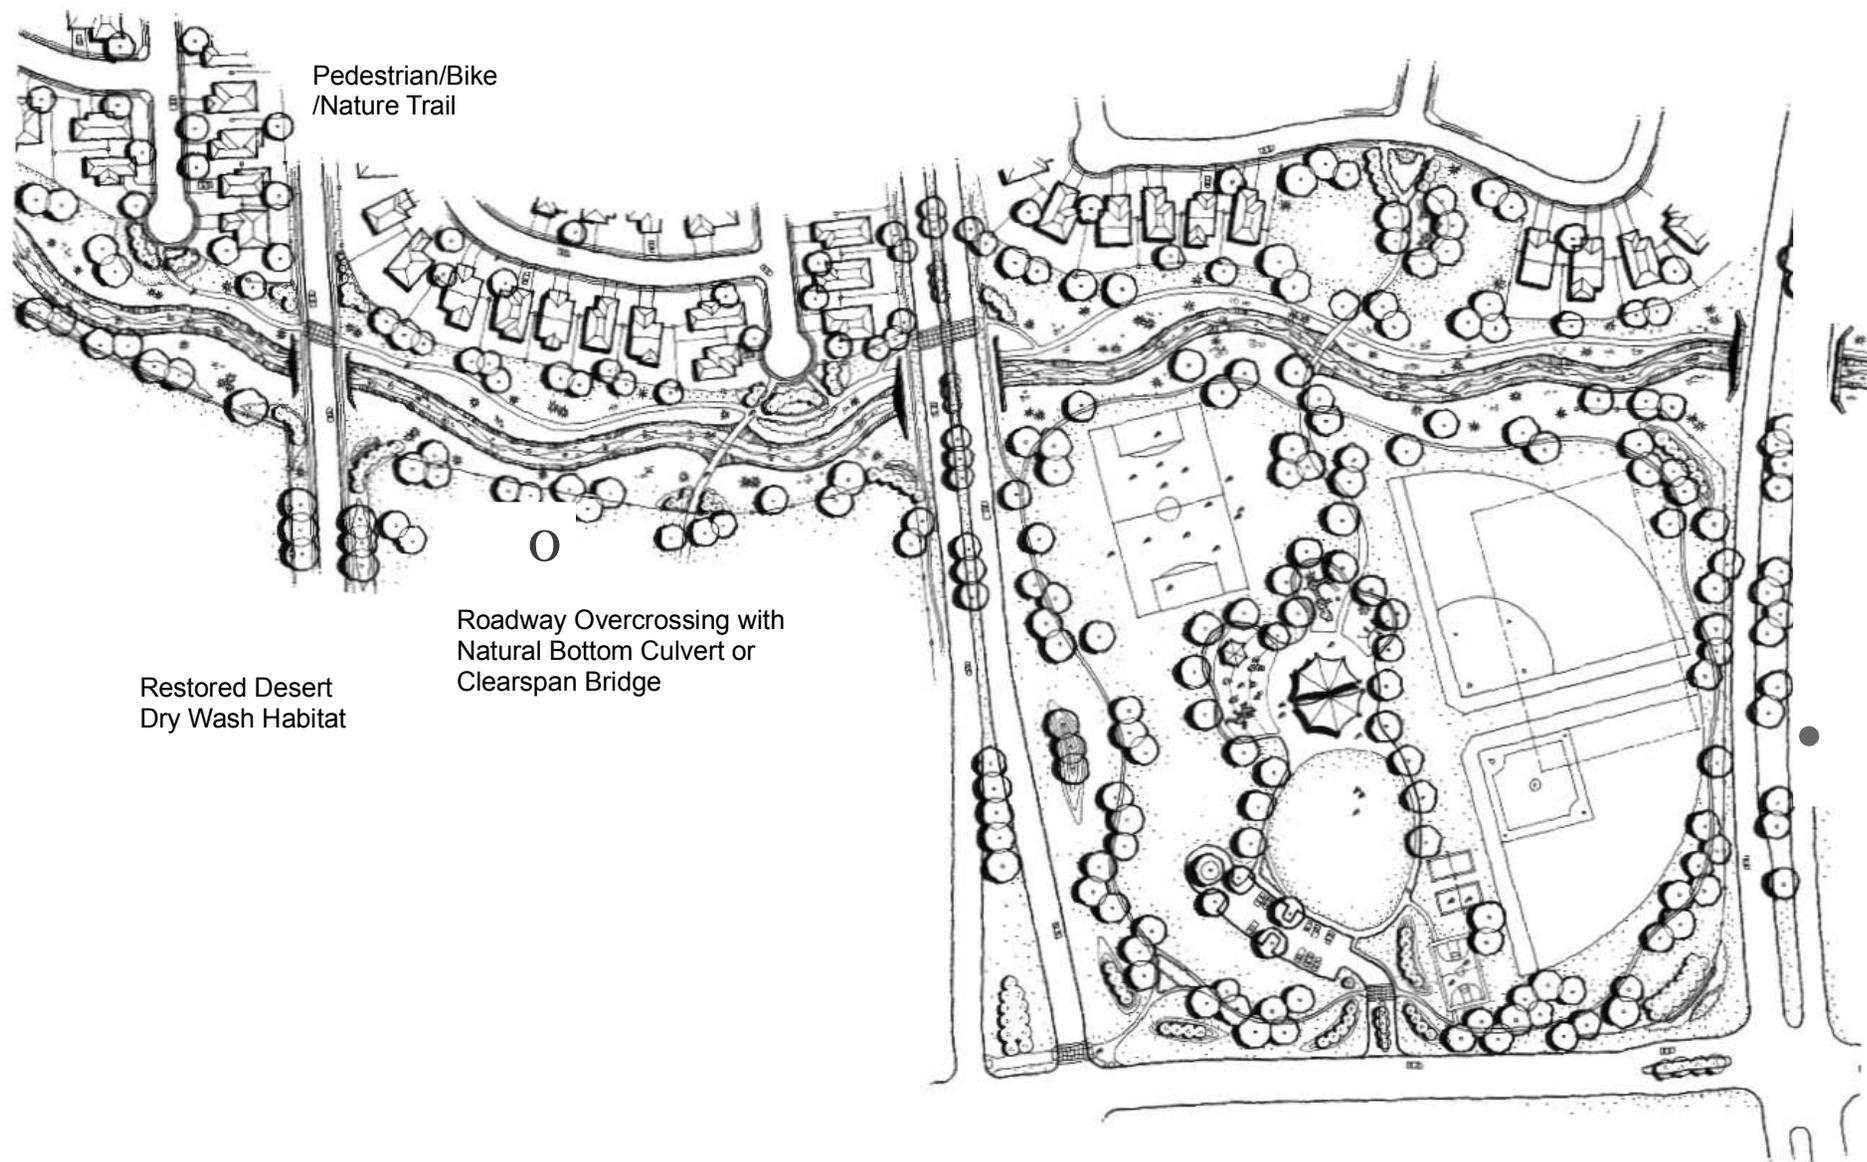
Plan View, Typical Trail Design Within Preserve Area
